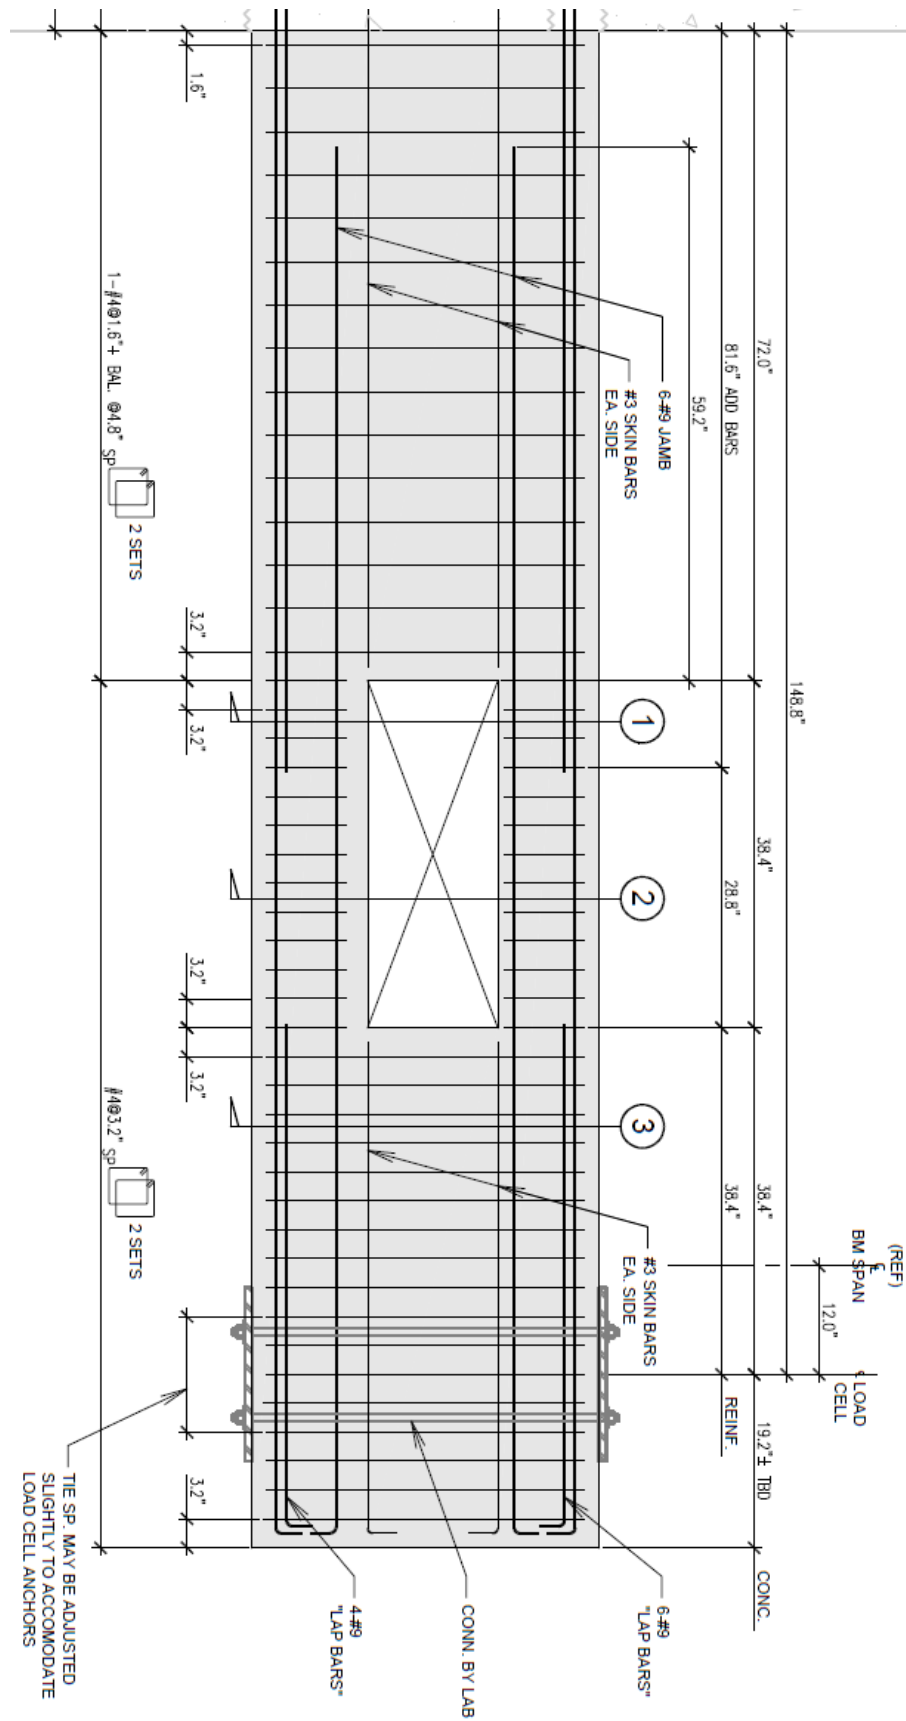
Side elevation of Specimen 2 (Lemnitzer et al., 2013).
